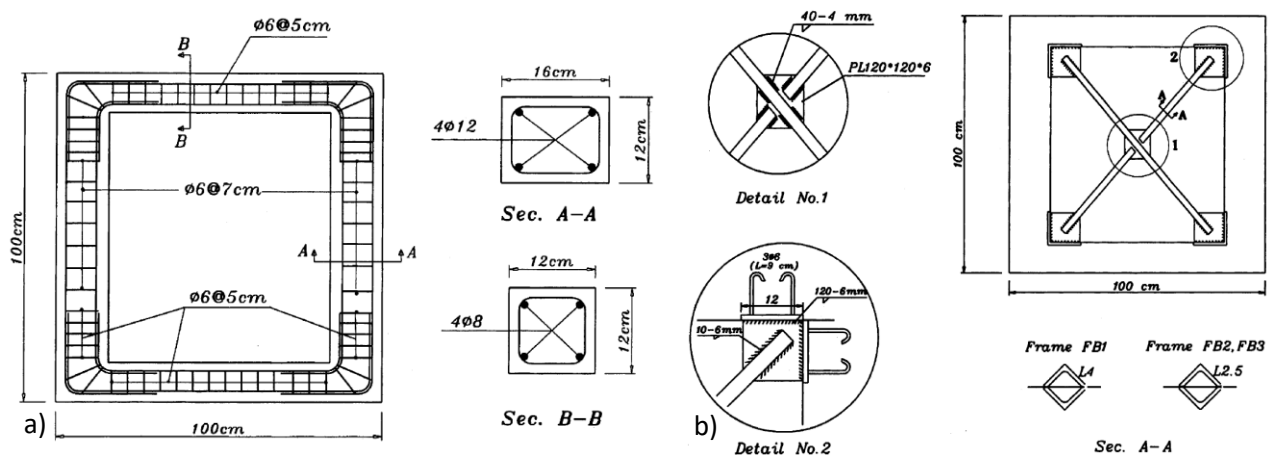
a) Dimensions and reinforcement detail of the RC-frame specimen; b) details of the X-bracing system and its connection to the RC frame
